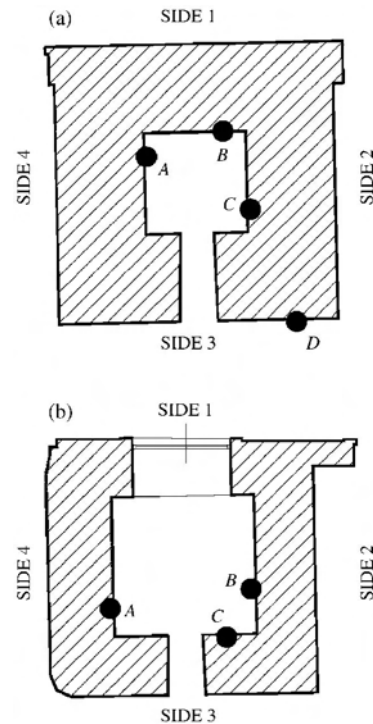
The plan scheme of the sites of the single and double flat-jack tests. Test sites at the foundation floor (a), and at the ground floor (b).
